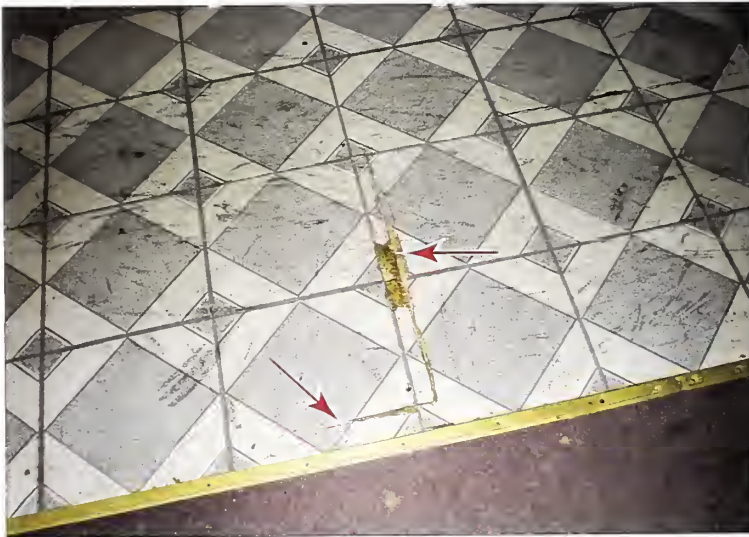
The wearing surface and color layer of this vinyl flooring are completely scraped off in places. This damage cannot be repaired. The flooring should be replaced.
